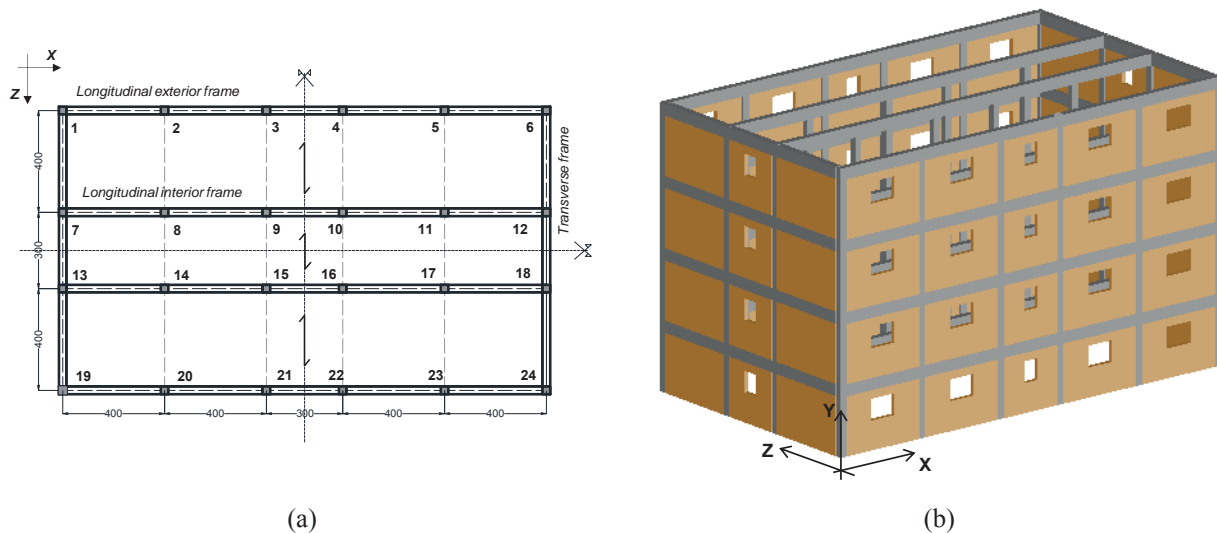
Plan view of the case-study buildings and column labels (a) (measures in centimetres); 3D view (b)
